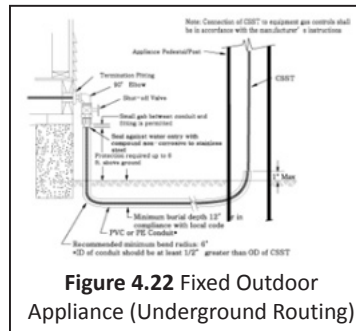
Fixed Outdoor Appliance (Underground Routing)
